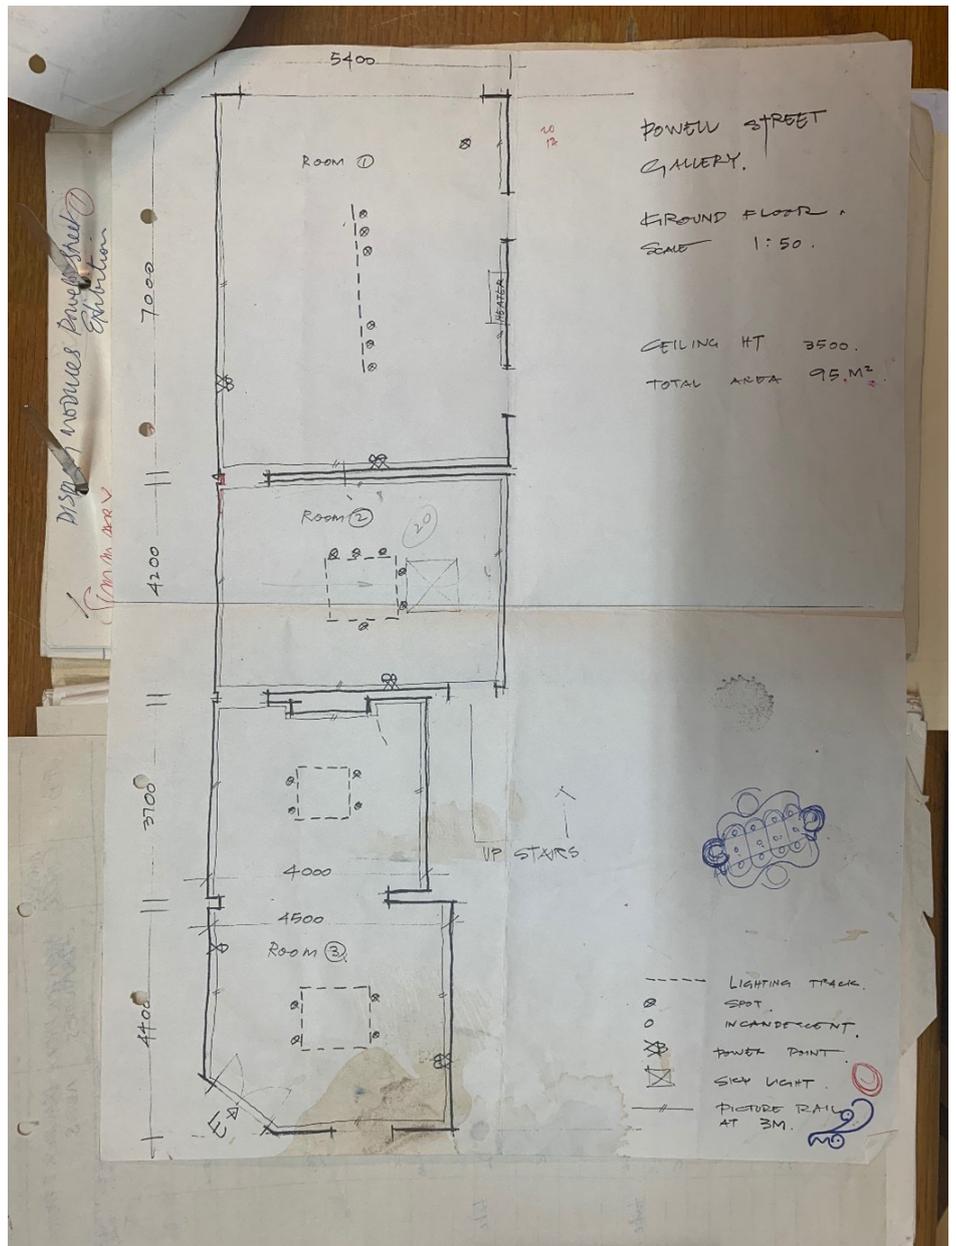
Plan of the Powell Street Gallery. Greg Burgess Archive
